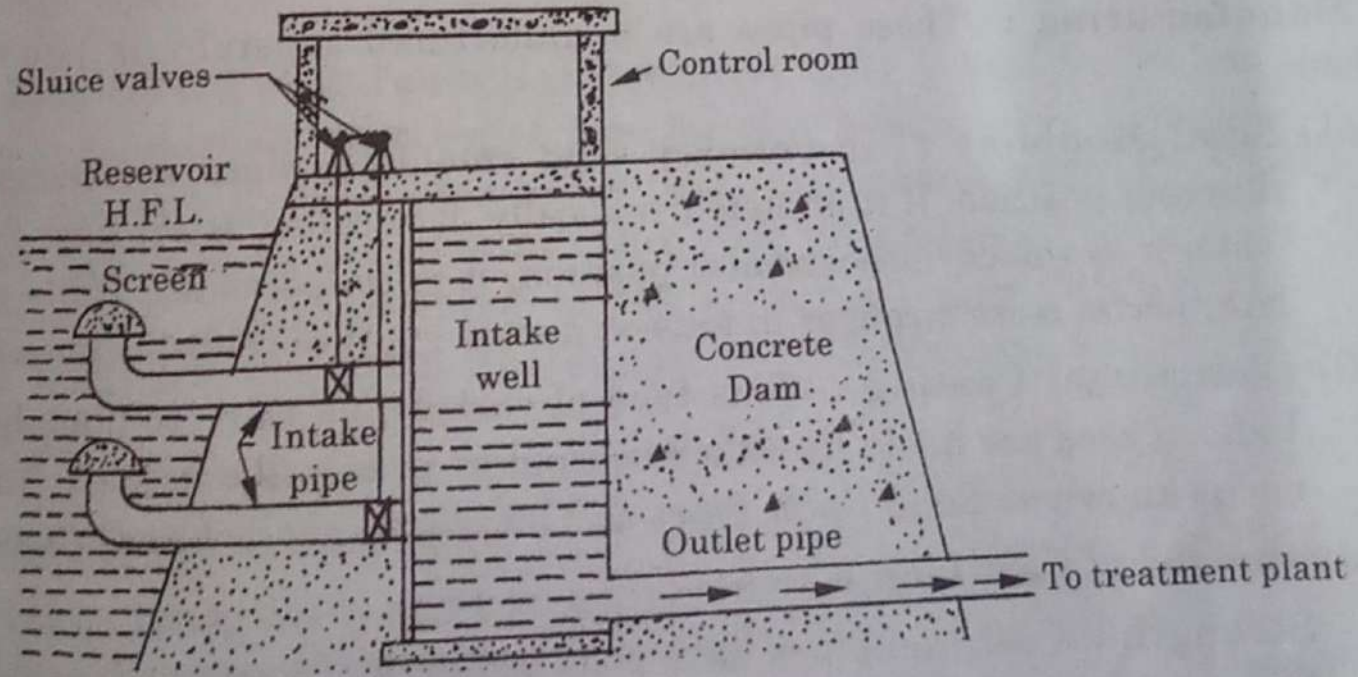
(b) : Reservoir Intake in Concrete Dam
